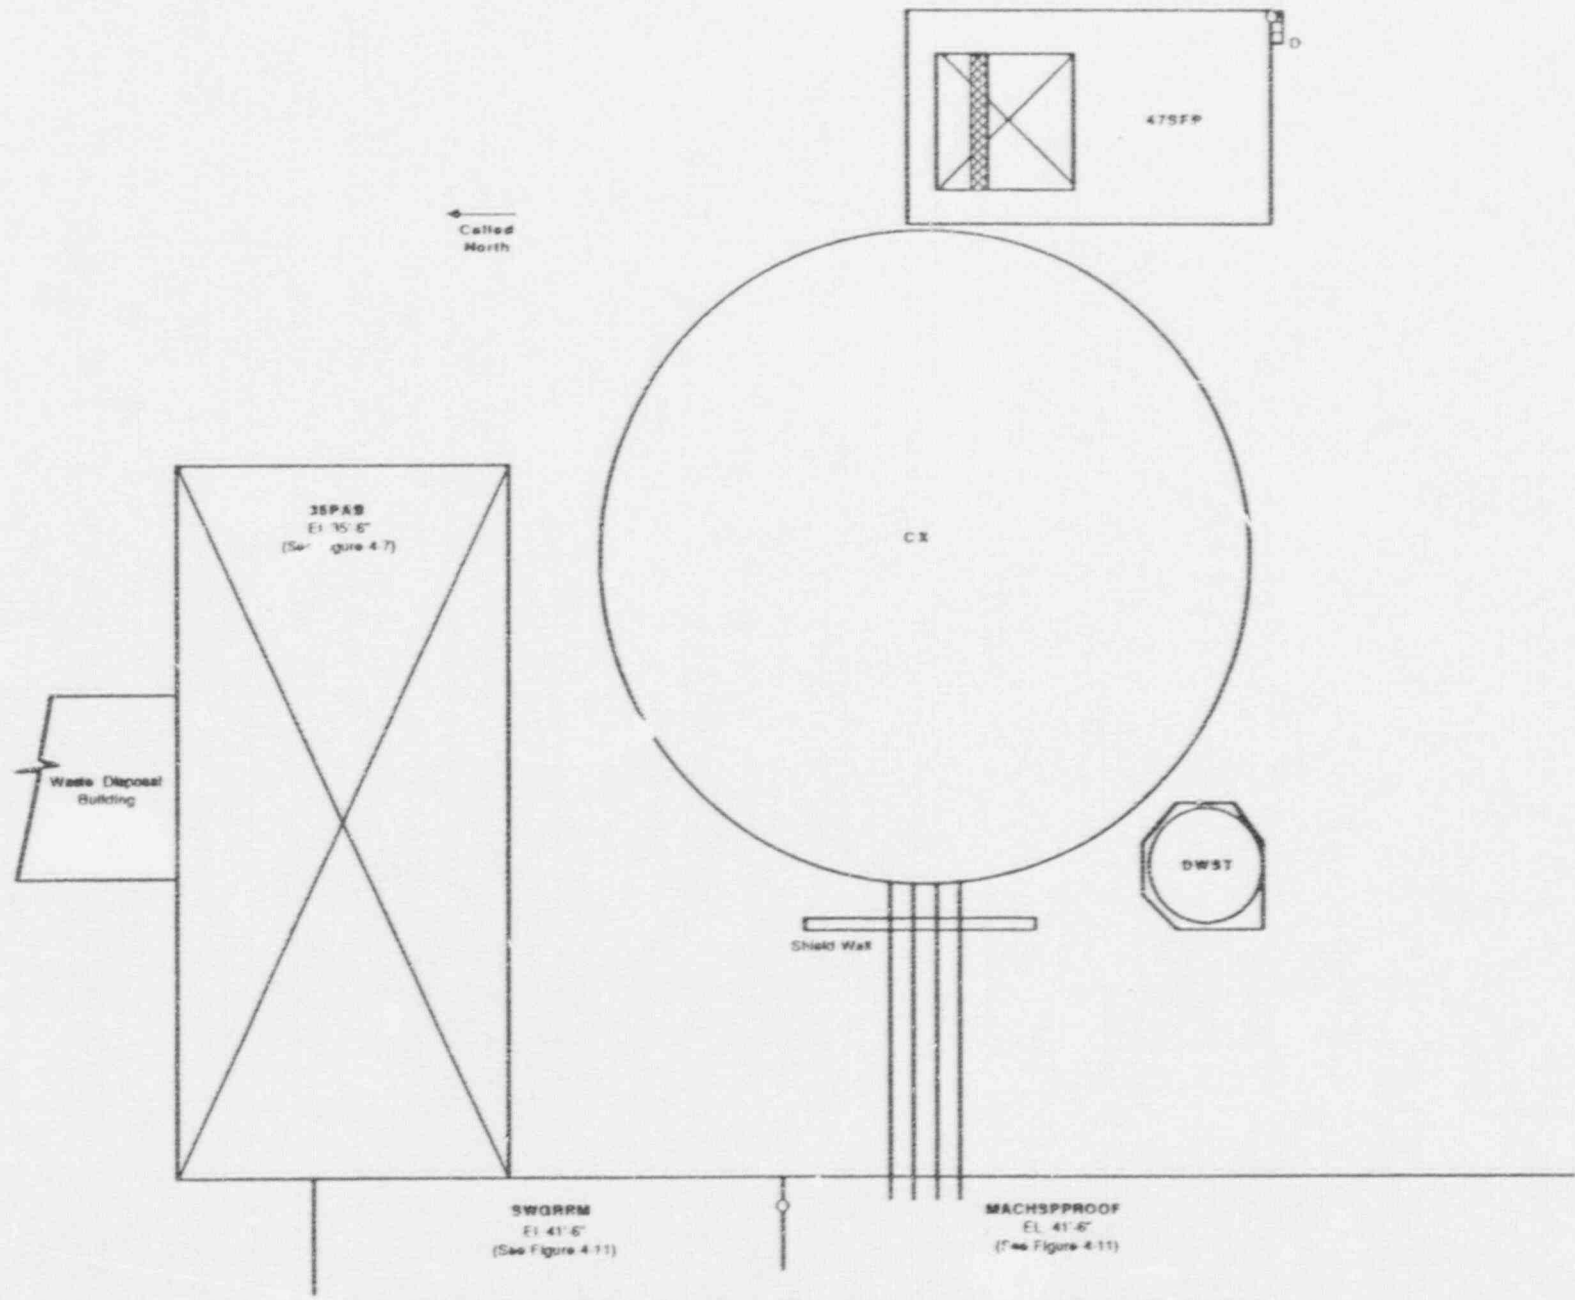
Haddam Neck Reactor Containment, Auxiliary Building, and Spent Fuel Building, Elevation 47'-0"
